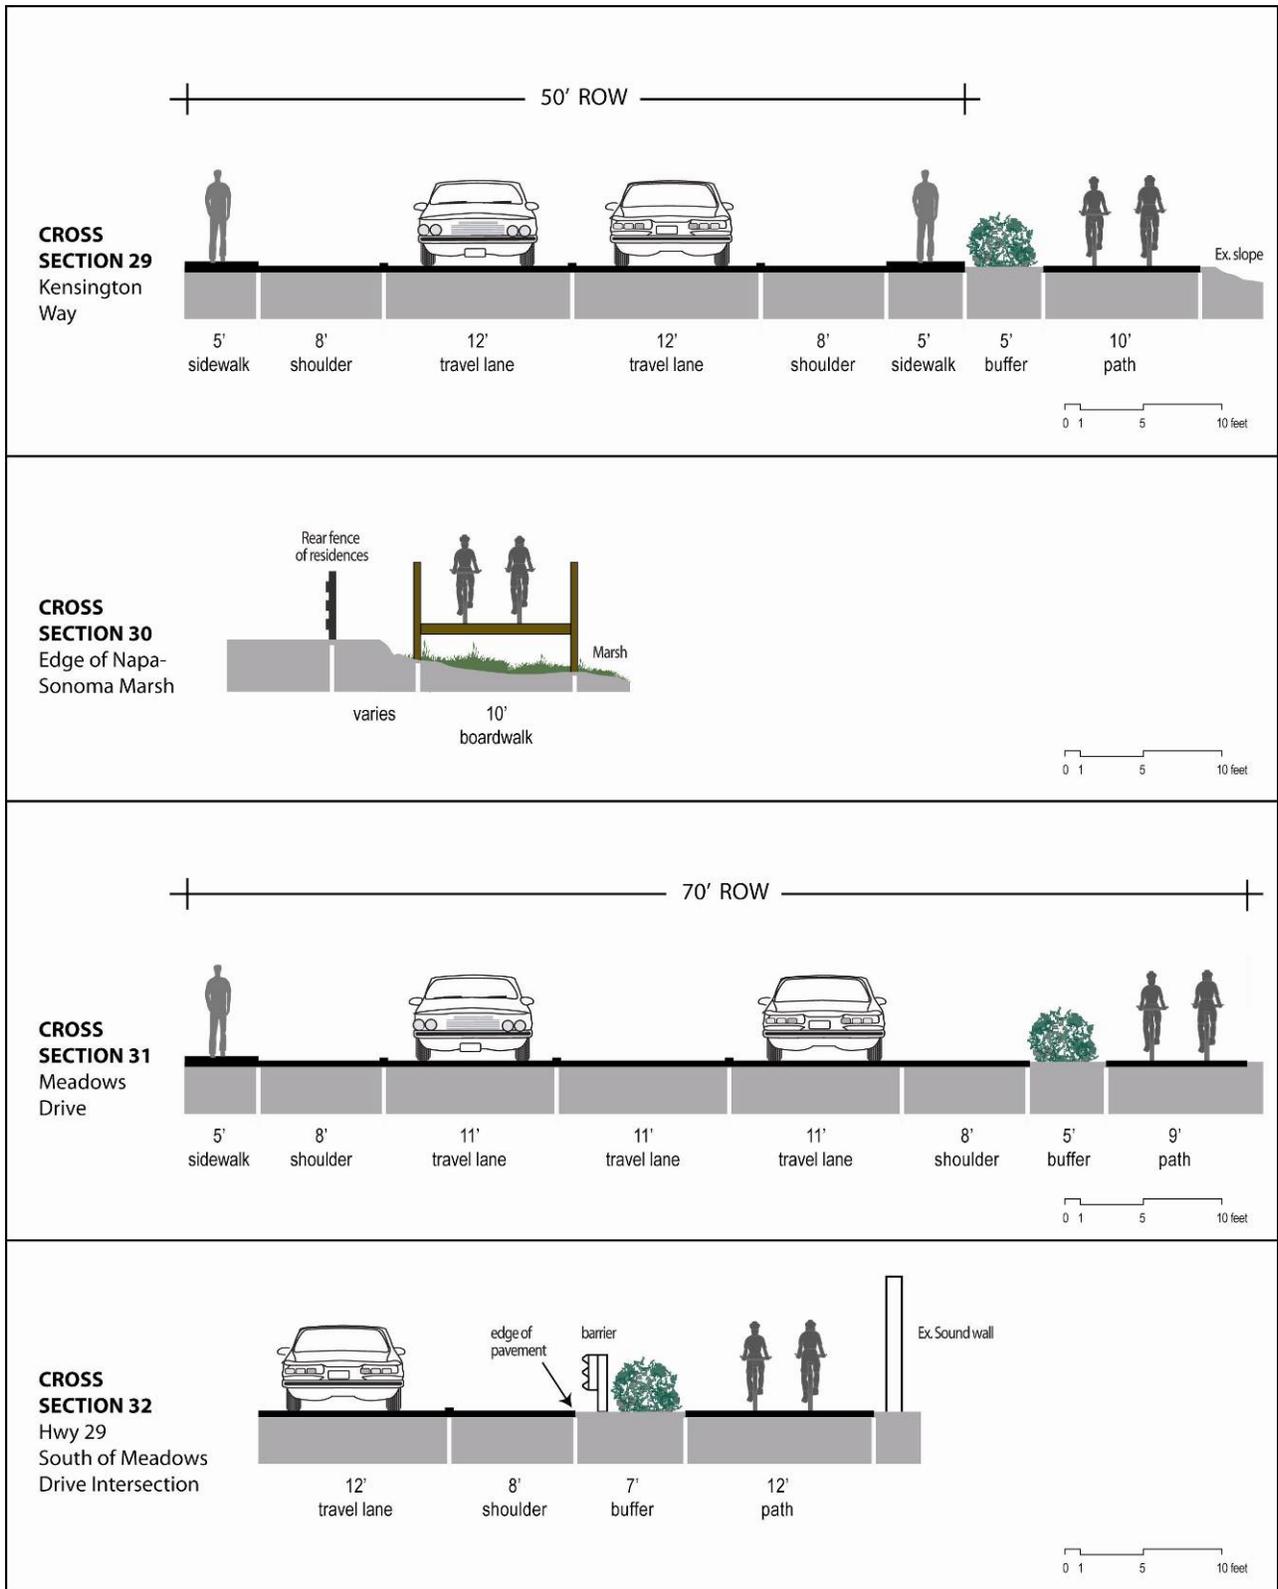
Napa Valley Greenway Typical Cross Sections
